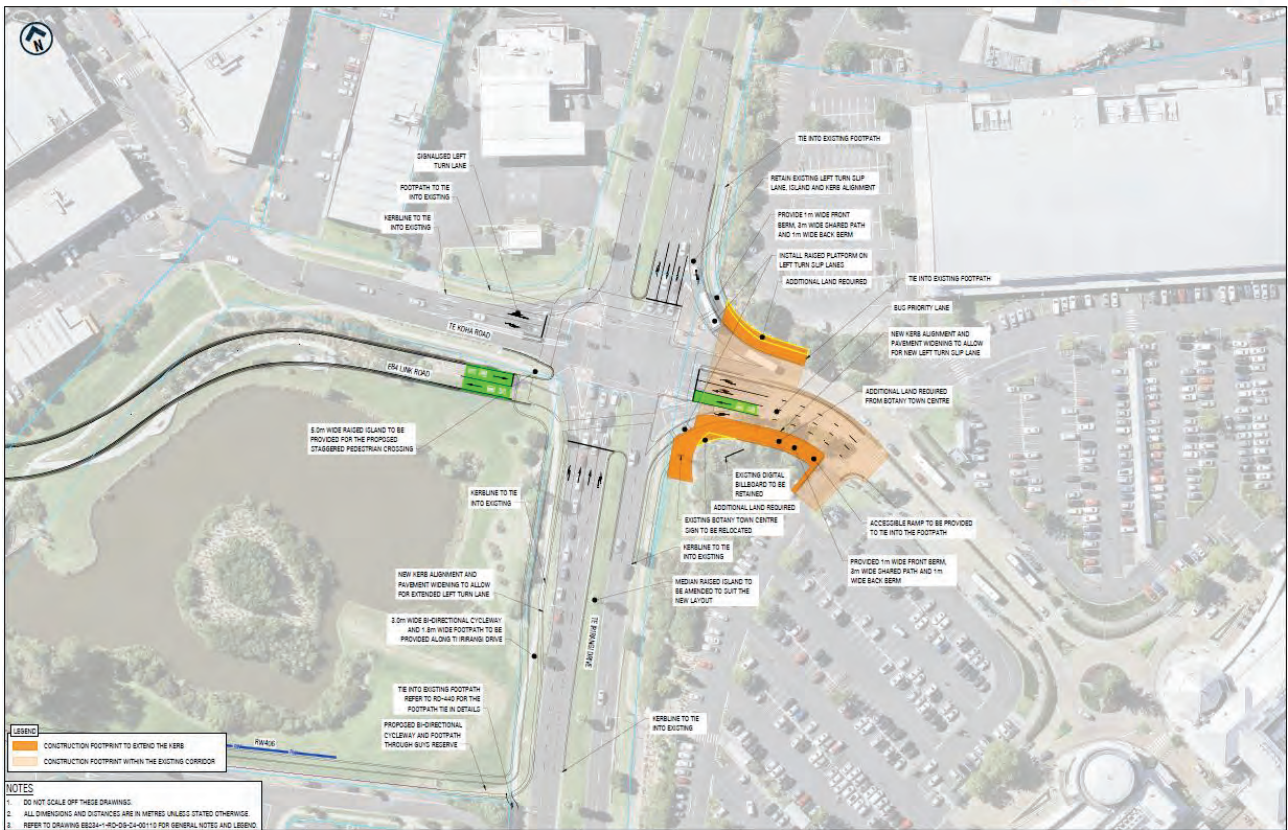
Te Irirangi Drive and Town Centre Drive intersection sketch design
